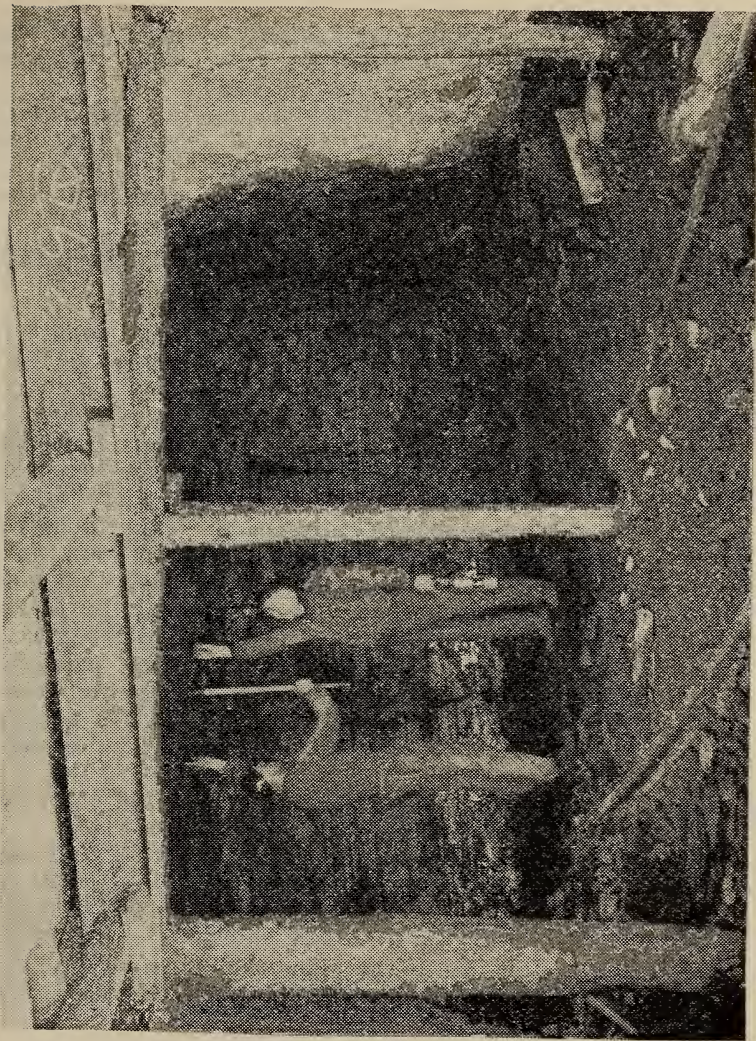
The vibration method should be employed for testing roof, and the roof should be tested often so that dangerous roof will be discovered before it falls.
